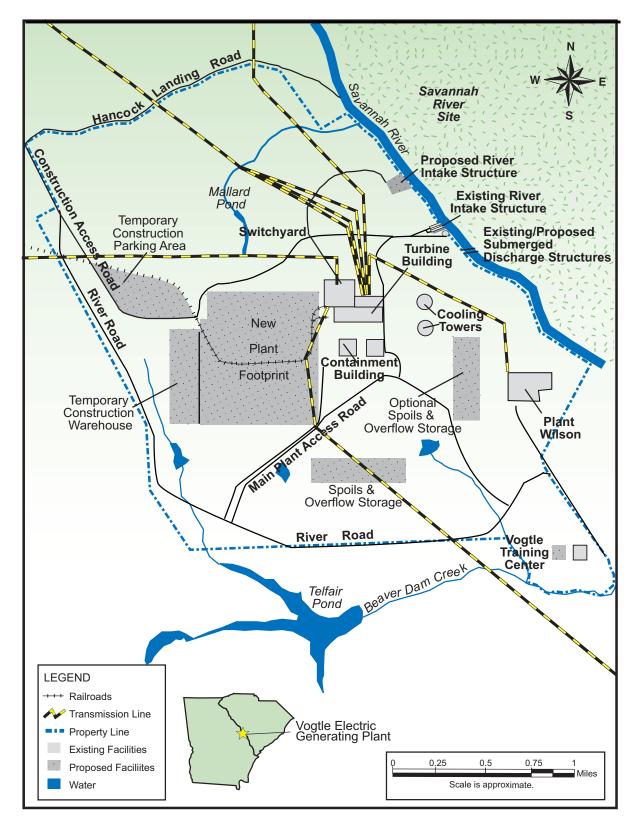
VEGP Site and Proposed New Plant Footprint
